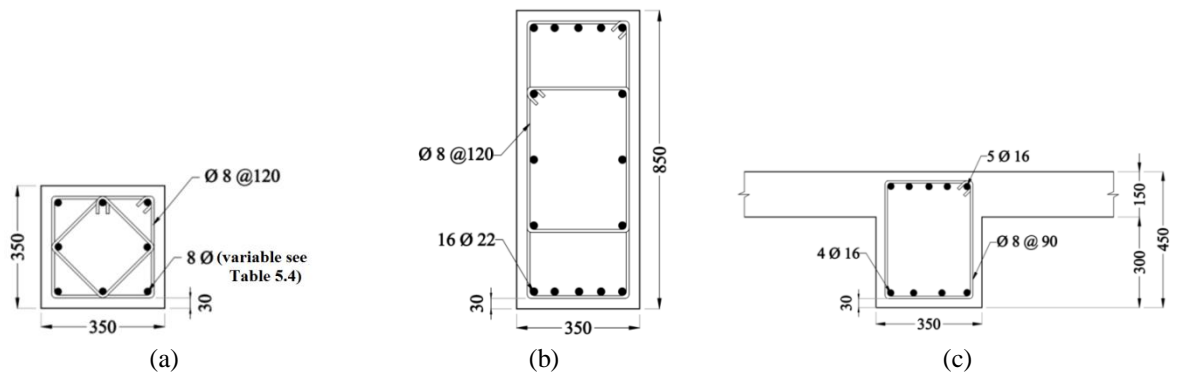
Cross-section details of EC8 M building (a) square column, (b) rectangular column, and (c) beam (all dimensions are in millimetres).
